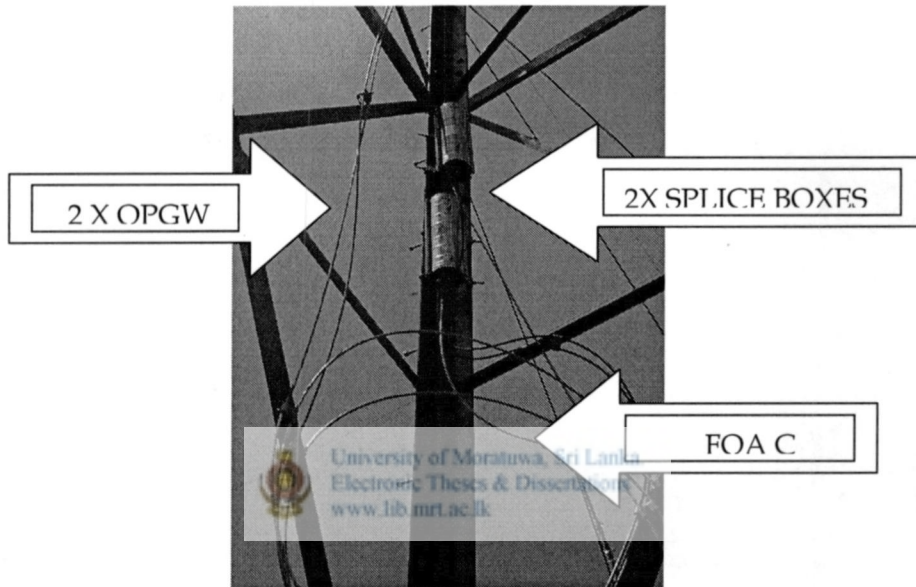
OPGW/FOAC Splice Box on the Tower Leg
